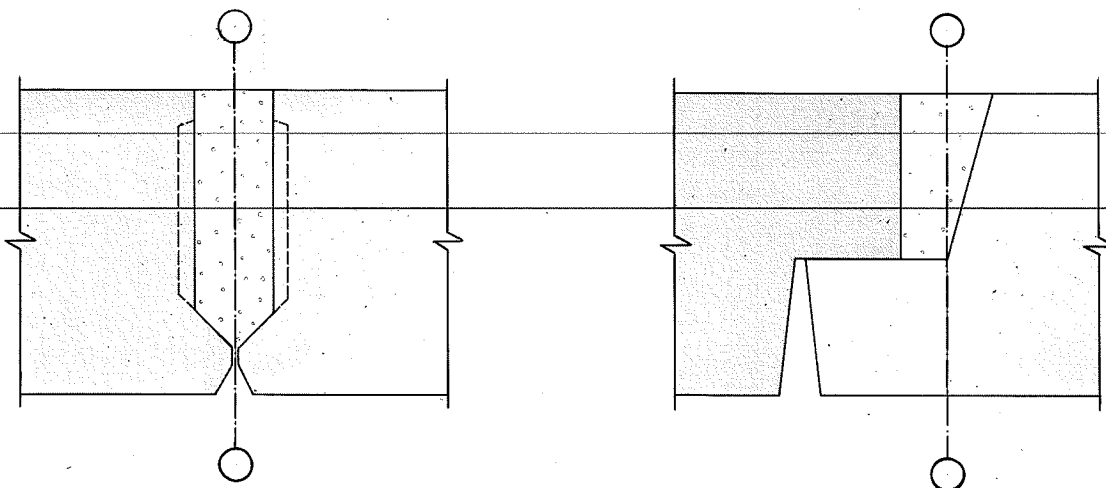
FLOOR-FLOOR JOINTS IN THE "TERRAFORM" SYSTEM, 1:5.
